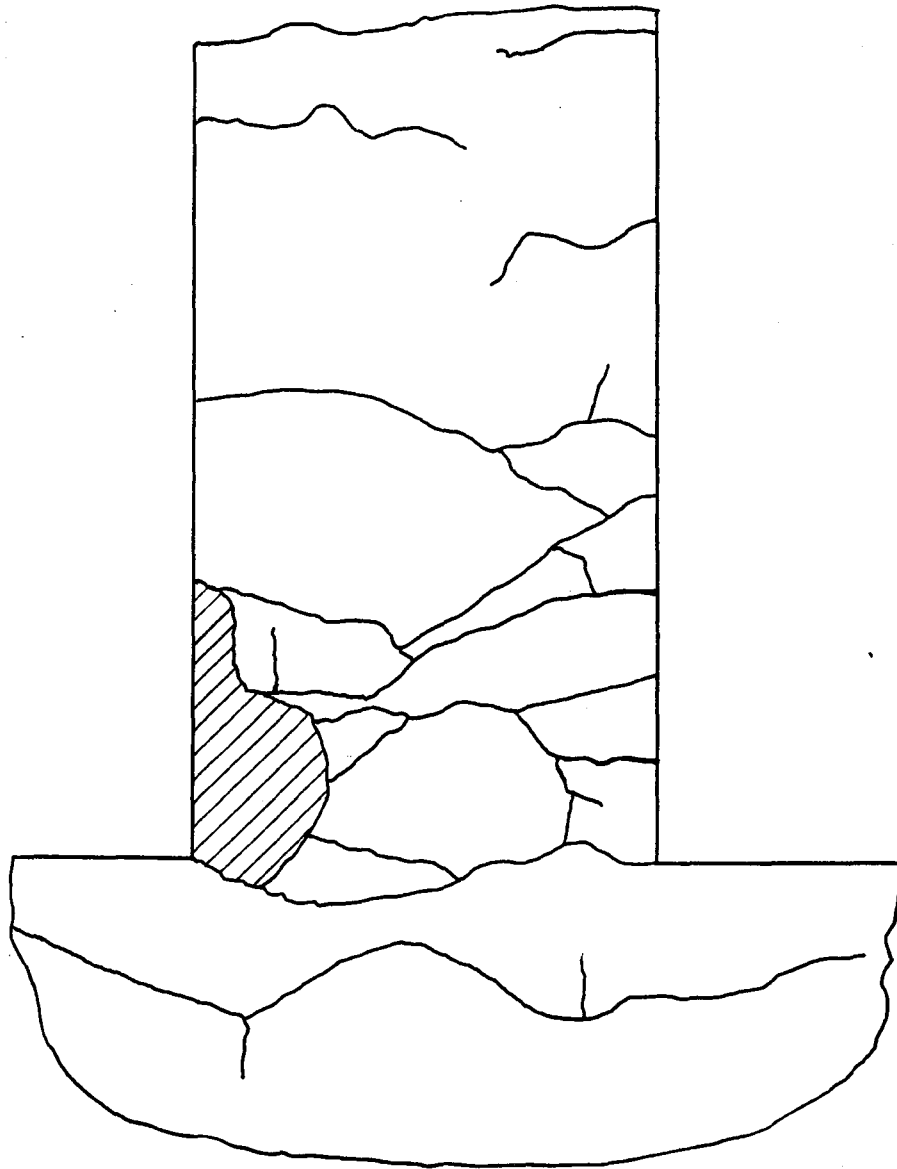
(b) Crack Pattern North Face, Specimen L4D2
